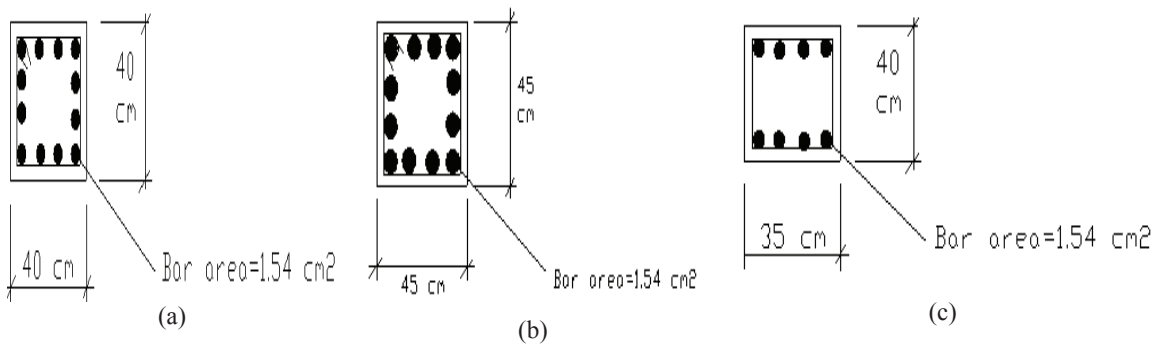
Members reinforcements; (a) Exterior columns, (b) Interior columns, (c) Section girders.
